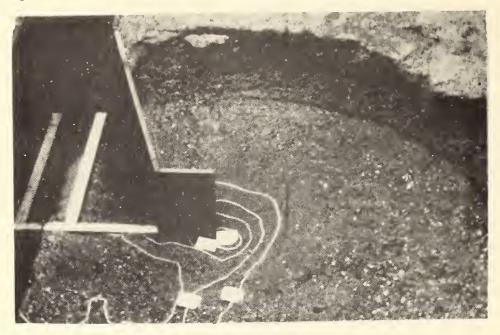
Rectangular-shaped wingwall and severe erosion of fill and at the end of the wingwall.
